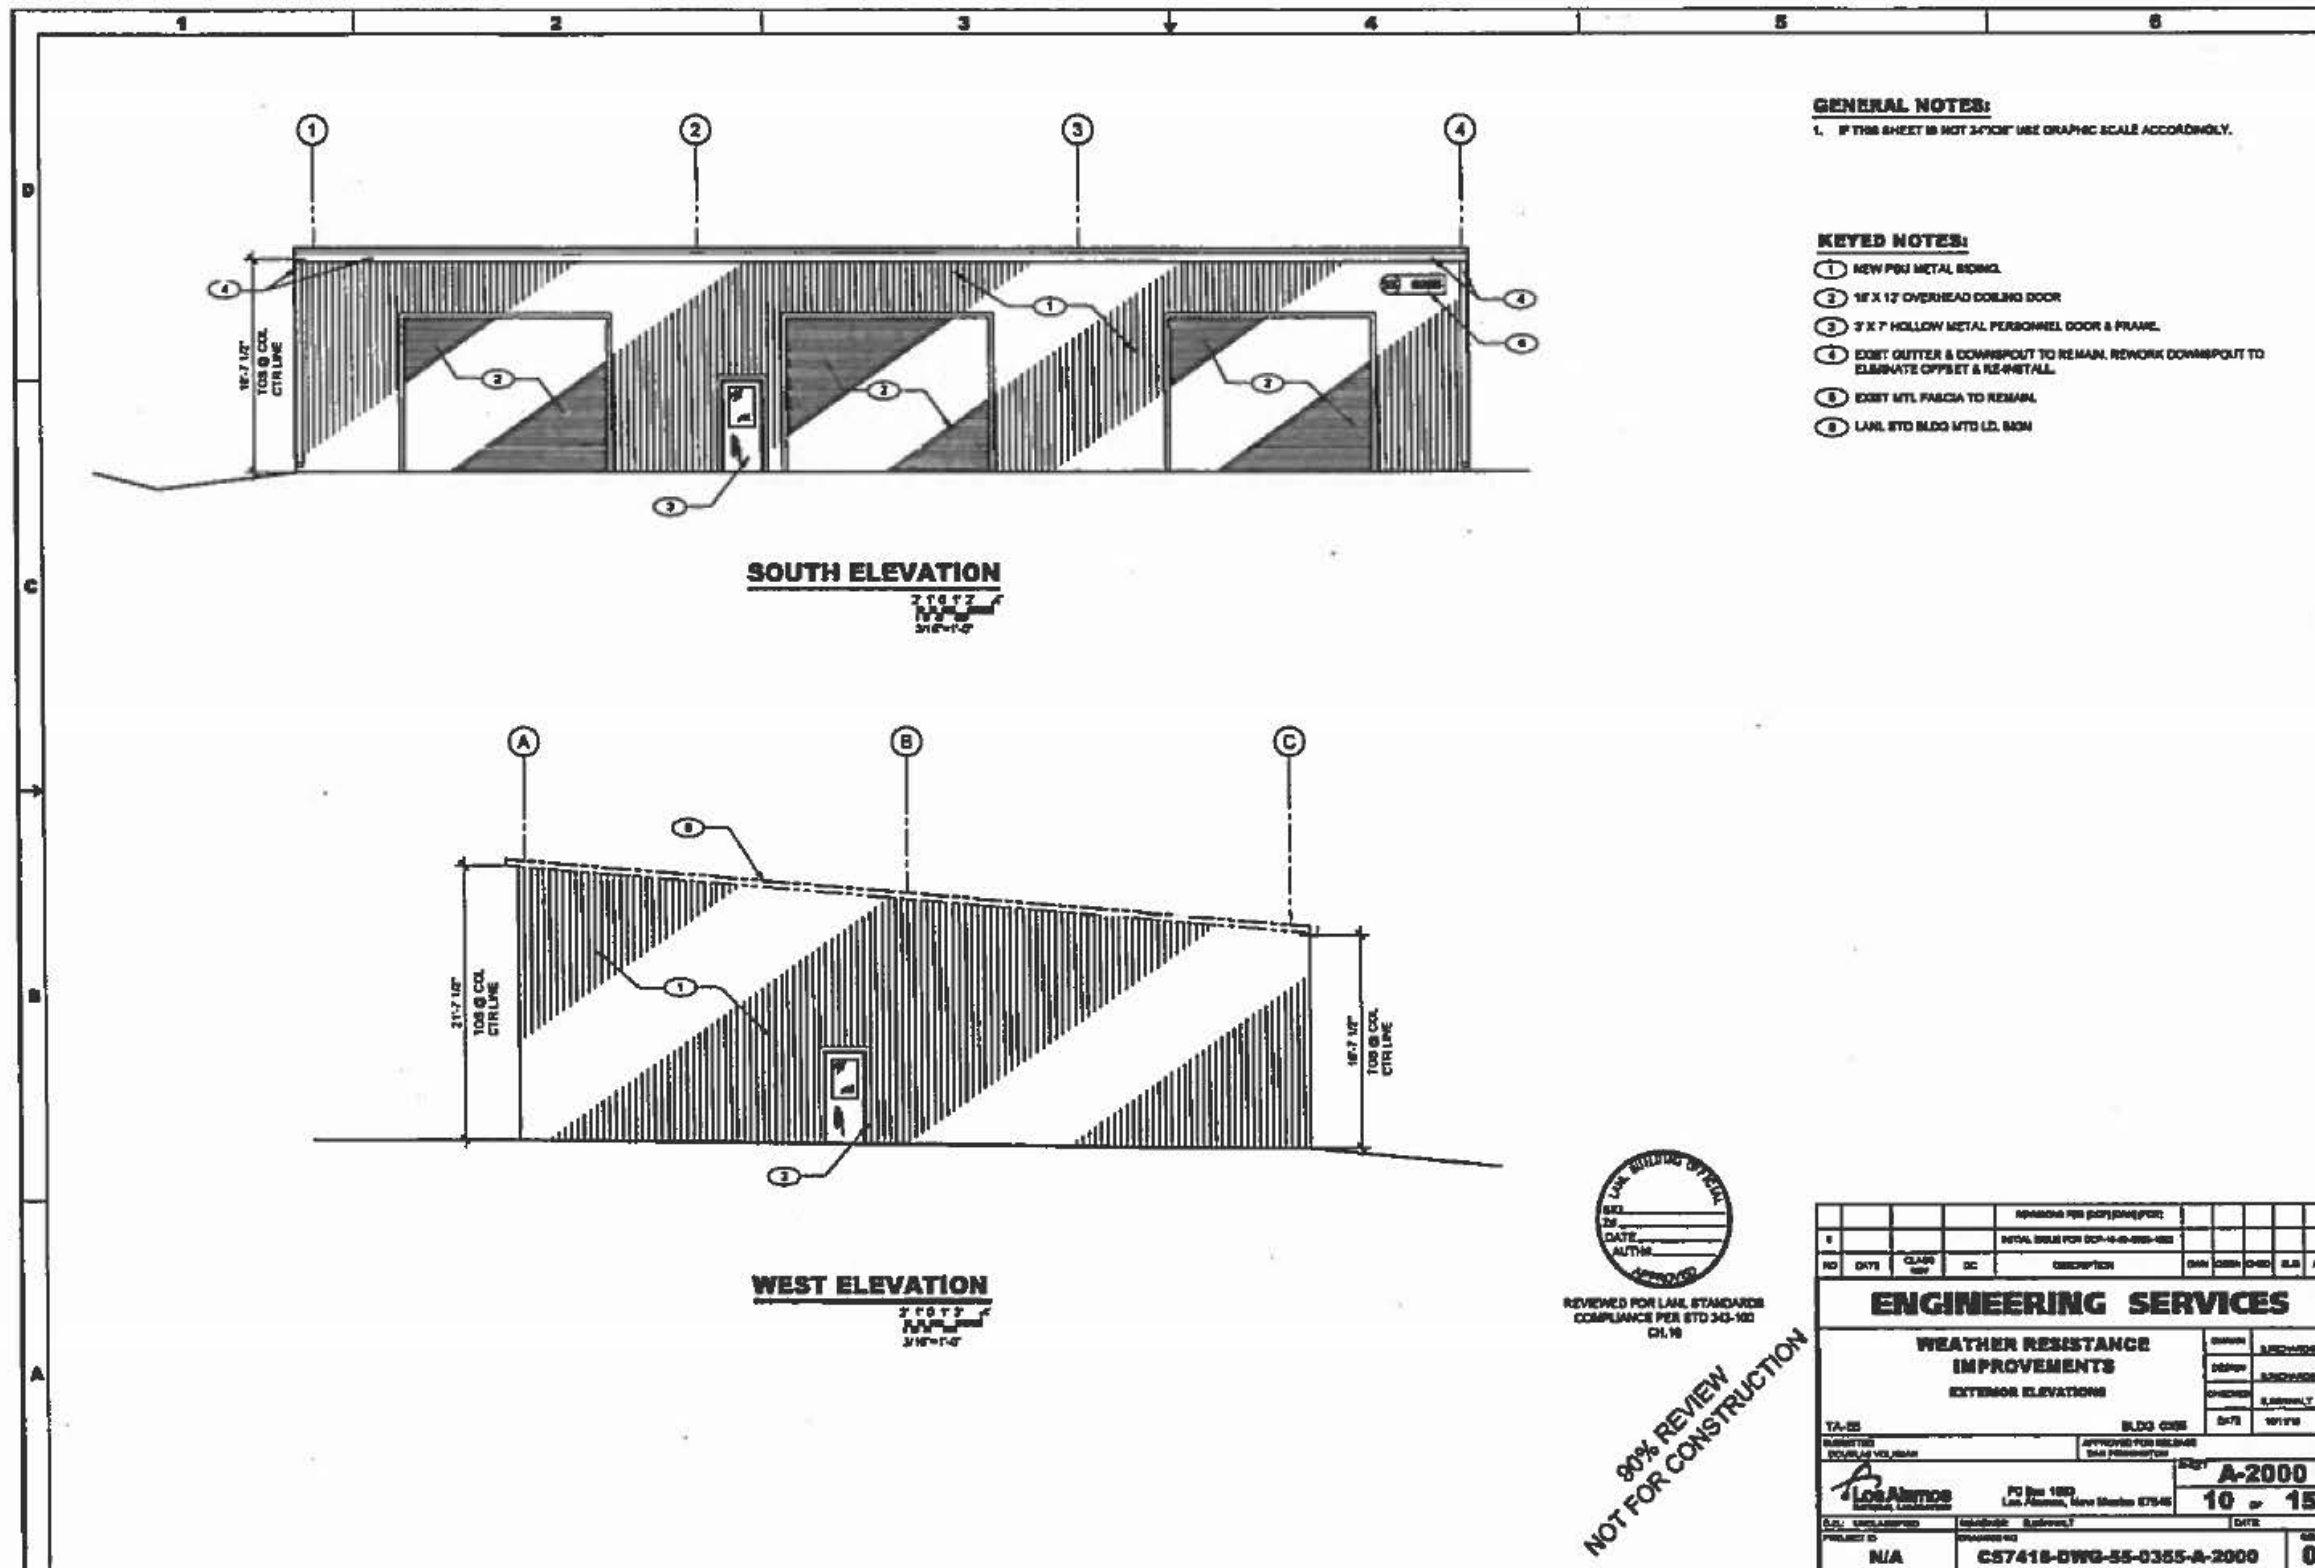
TA-55-0355 Design Drawing (Wind Walls)
